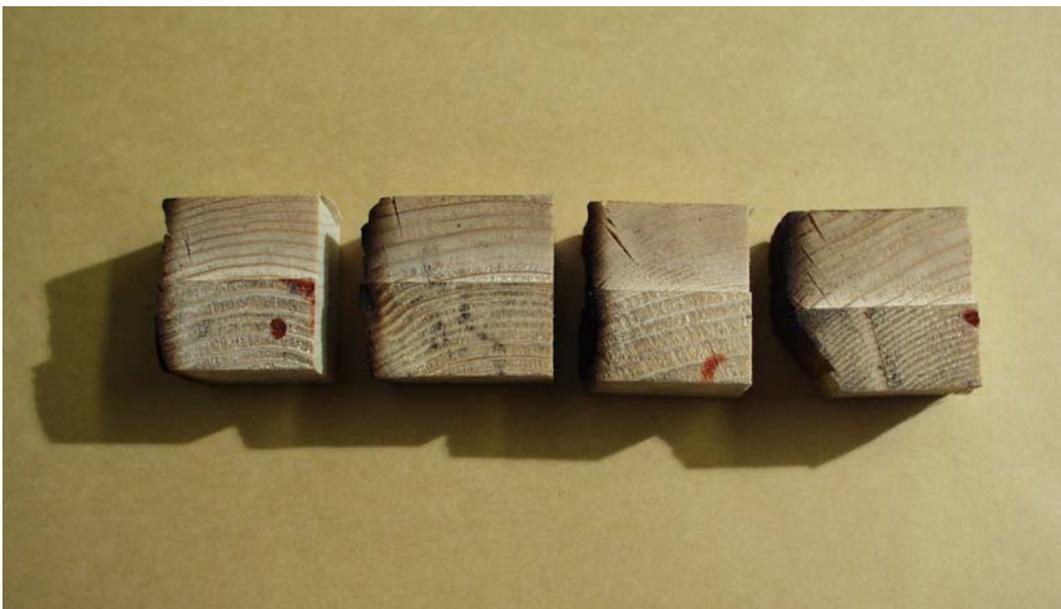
Radial checking in wood samples cut close to the charred surface of beams exposed to fire.
